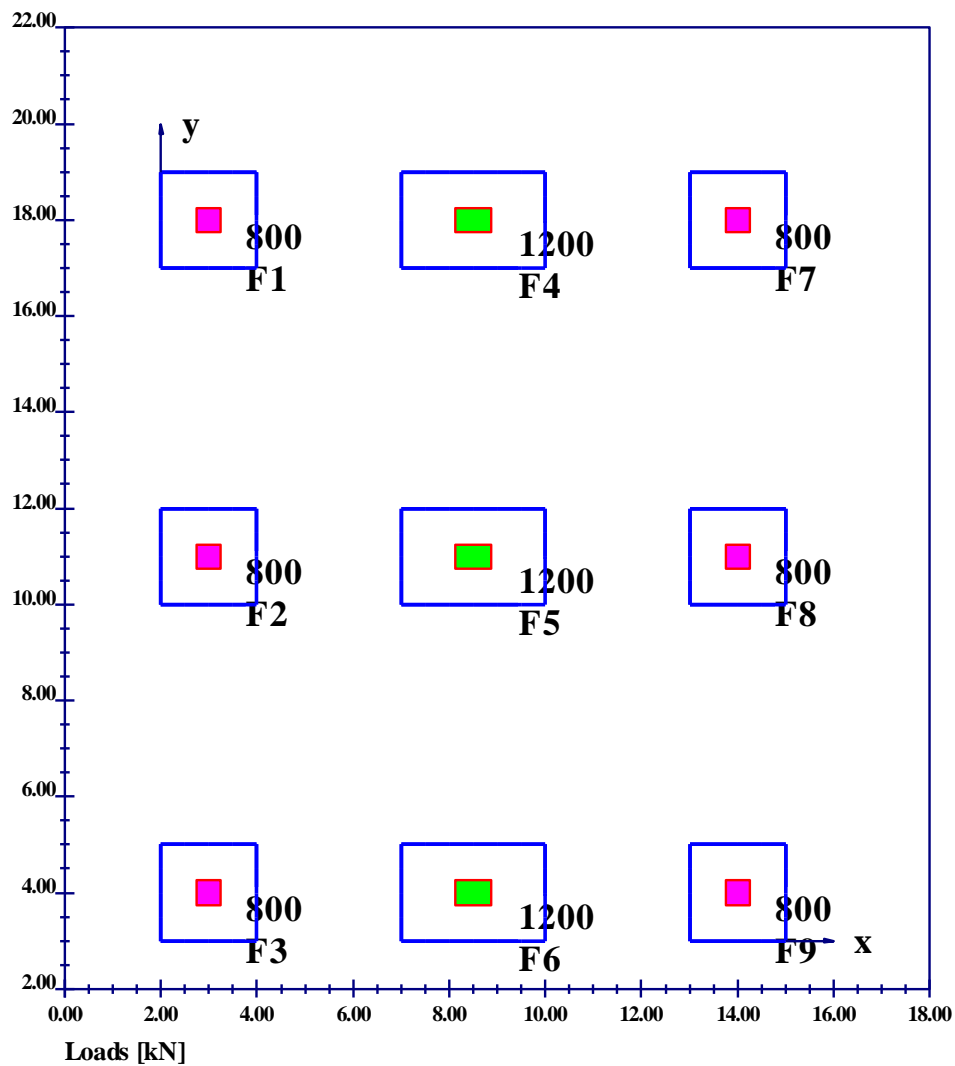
Foundation plan of the group of 9 isolated footings with loads [kN]
